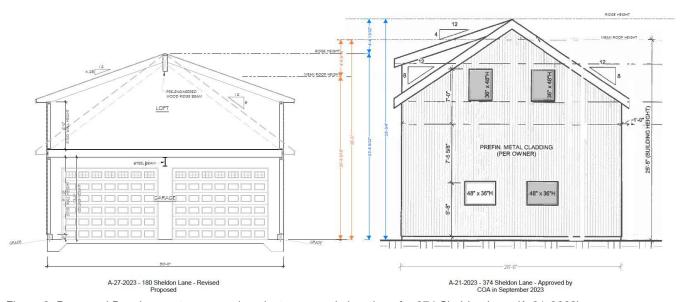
Proposed Development compared against approved elevations for 374 Sheldon Lane (A-21-2023).
